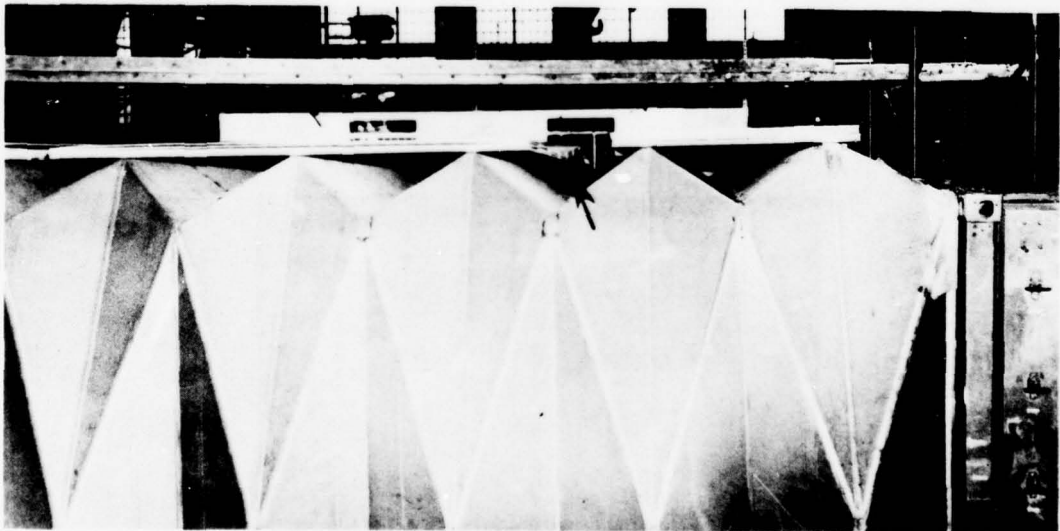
Exterior side view photograph of shelter showing plywood sheets loading on accordion shell roof after sixth loading increment was applied.
